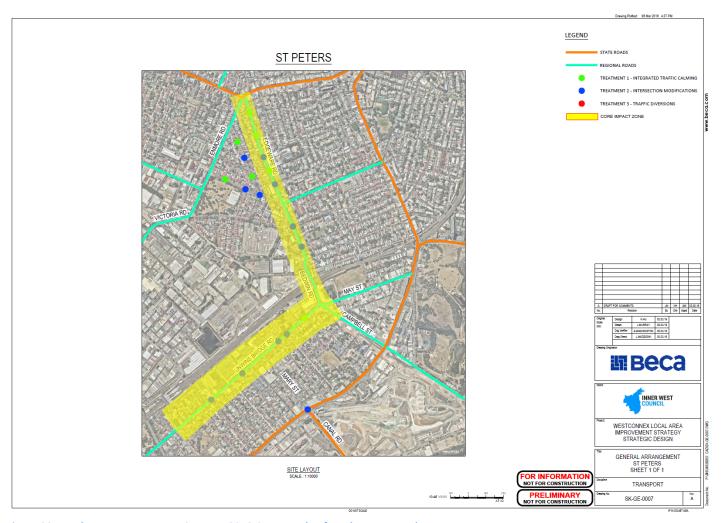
Local Area Improvement Strategy 2018 Concept Plan for Edgeware Road
